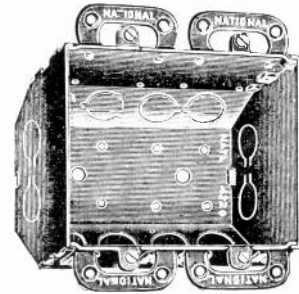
Double outlet box for mounting two switches, two receptacles, or a switch and receptacle.
